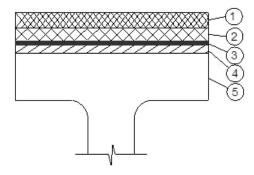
The proposed design of the roadway with the laying of aluminum sheet on the leveling layer (option 1): 1-top layer of asphalt concrete pavement; 2-lower layer of asphalt concrete pavement; 3-waterproofing (aluminum sheet); 4-leveling layer; 5-plate main beam
